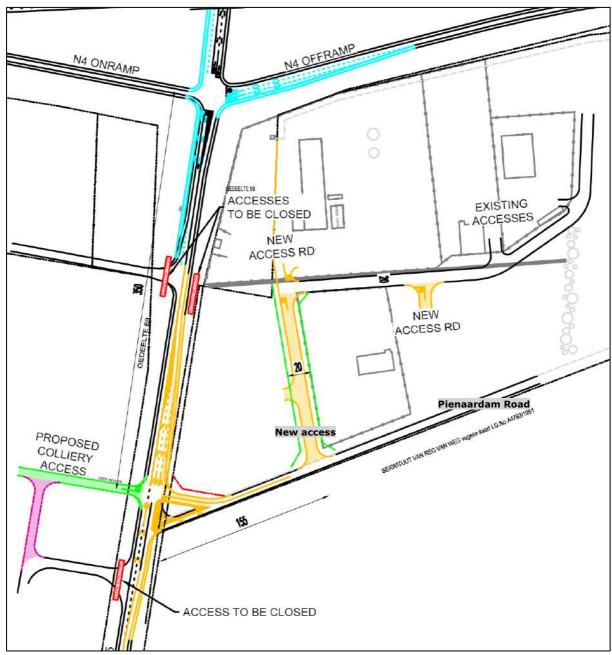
Alternative layout 3 (new access road from Pienaardam Road)
